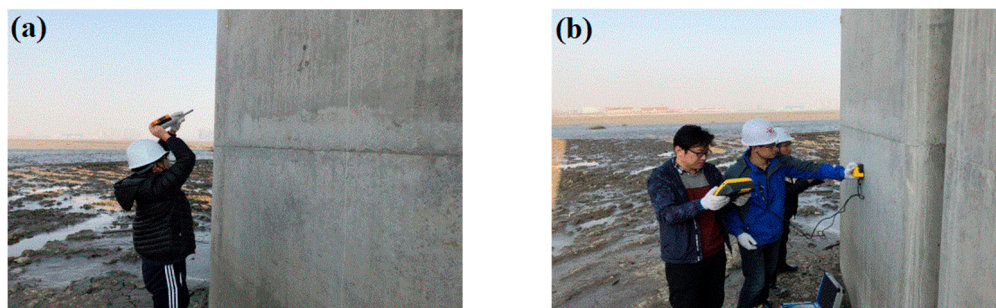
Reinforced concrete pier of the Jiaozhou Bay sea-crossing railway bridge (marine section).
